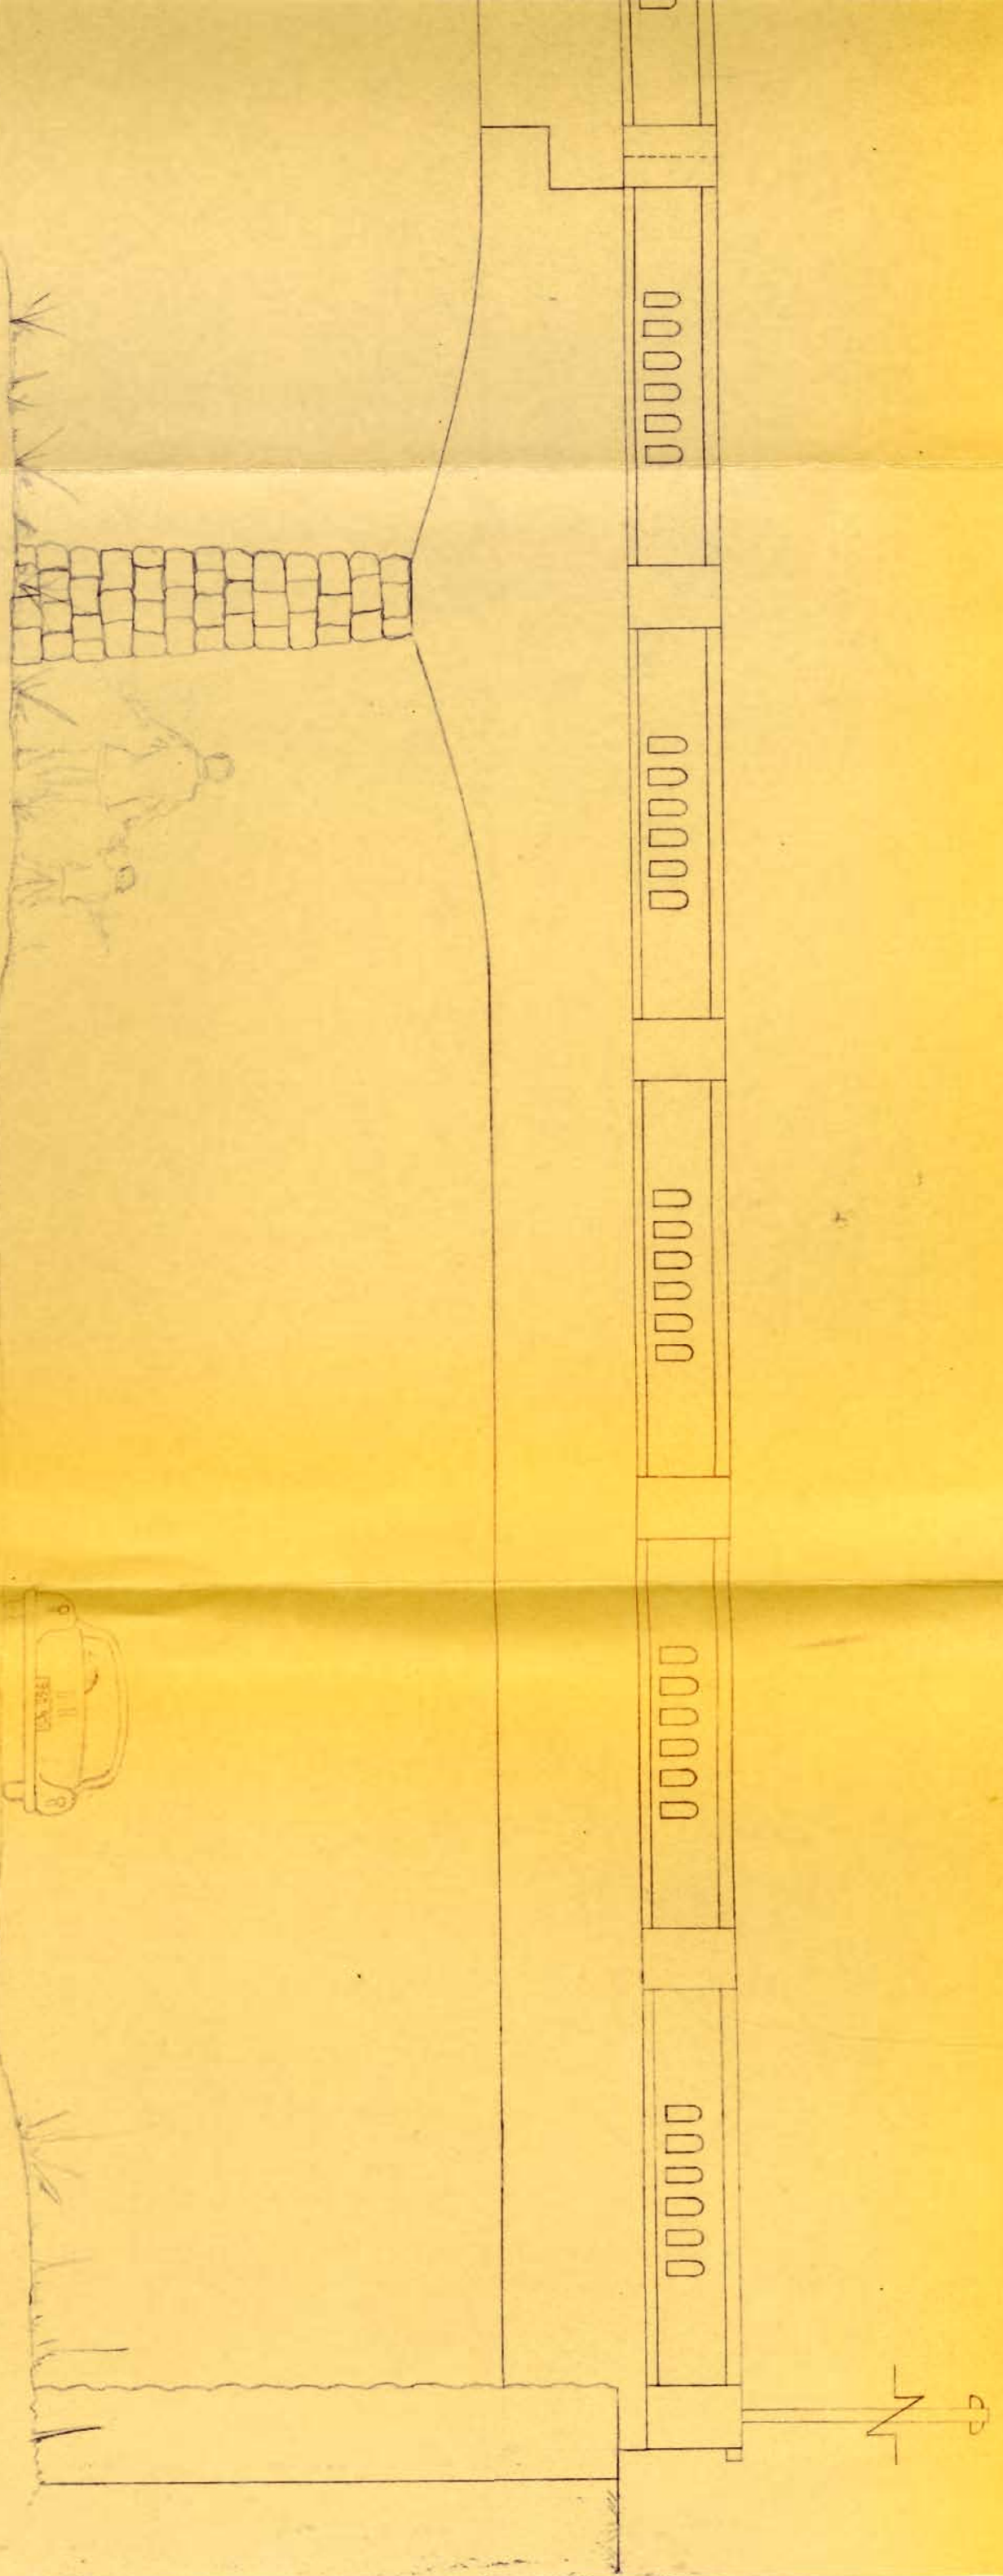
EAST ELEVATION OF THE BRIDGE SHOWING FUTURE BOULEVARDS ON BOTH SIDES OF THE RIVER
